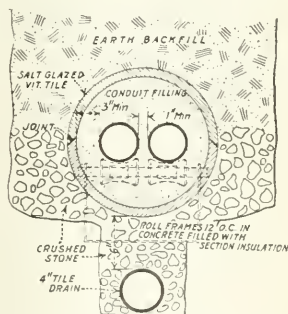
CONDUIT FOR CENTRAL STATION HOT-WATER HEATING SYSTEM
